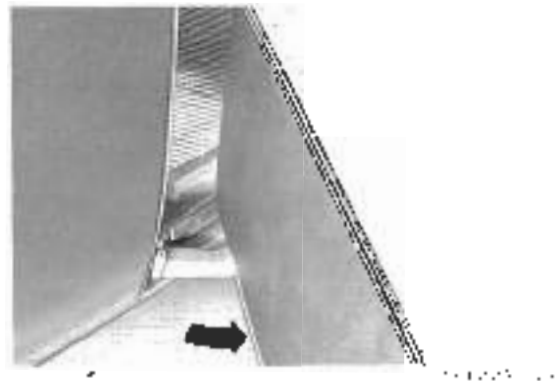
Door being swung outward (shown) so that the lower rollers can be unhooked from the bottom runner.
